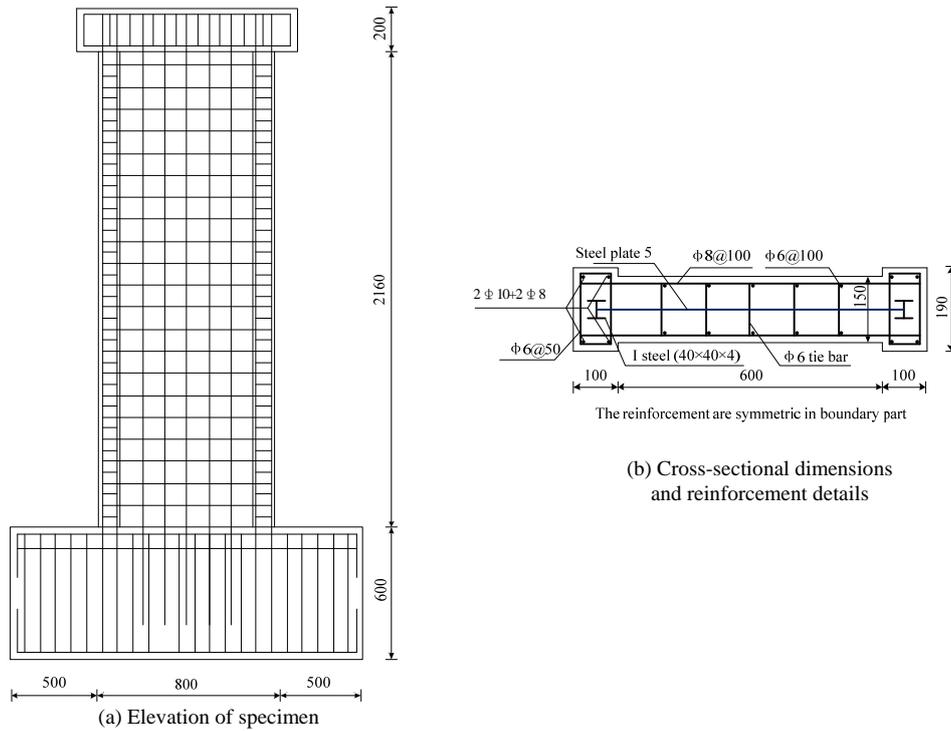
Elevation of specimen and cross-sectional views and reinforcement details (unit: mm)
